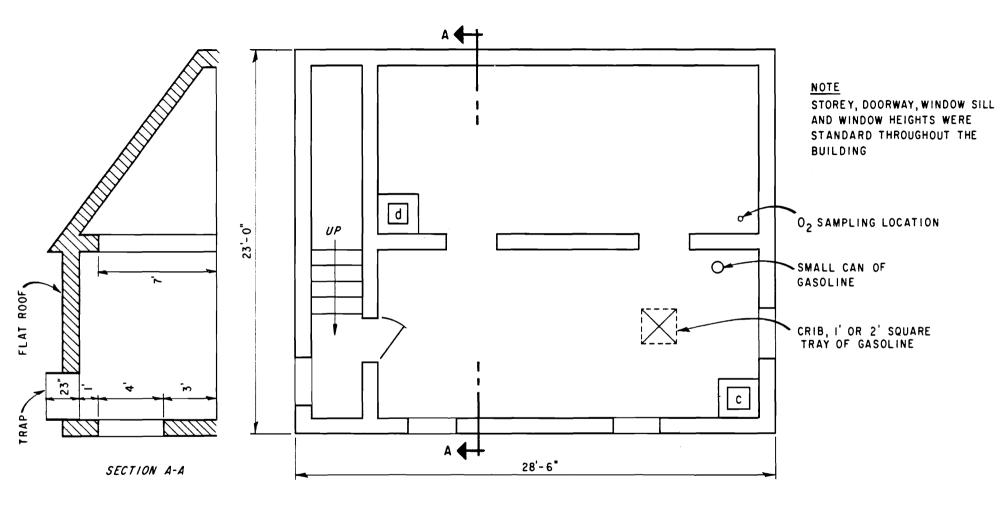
THIRD FLOOR PLAN, FIRE TEST BUILDING GRAVENHURST
